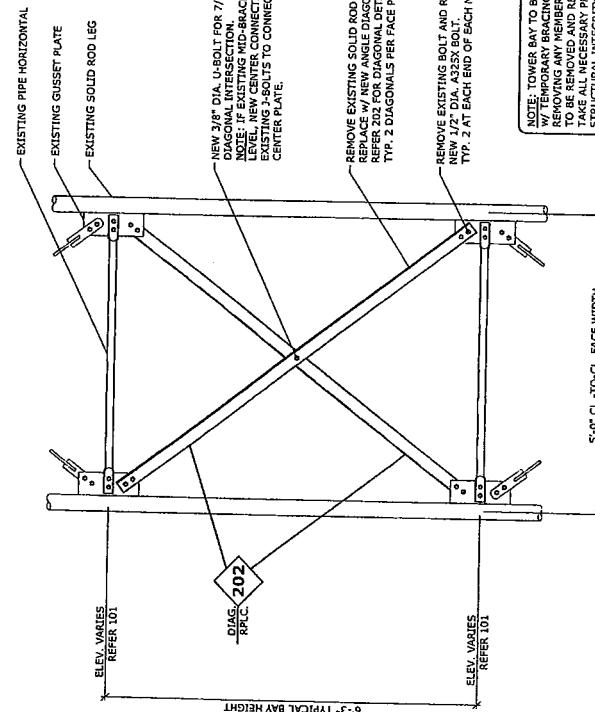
DETAIL: TYPICAL DIAGONAL REPLACEMENT
